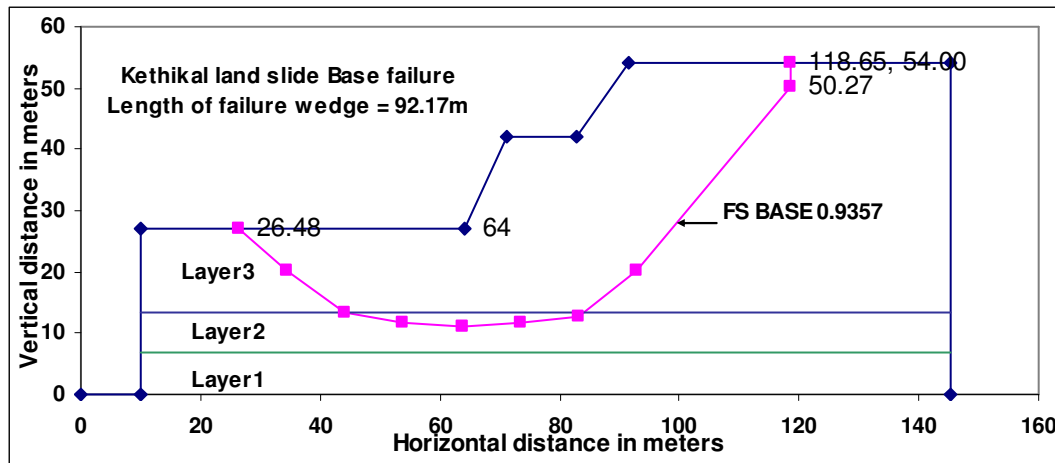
Failure surface in Kethikal land slide - Base failure in slope with presence of berm and tension crack.
